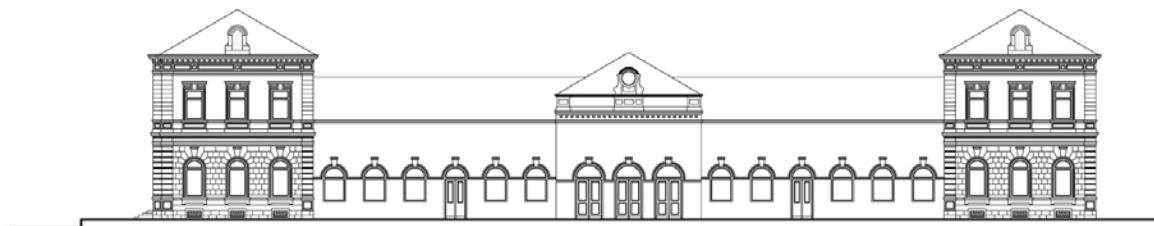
Railway station "Banja Luka City"; elevation view from east.
